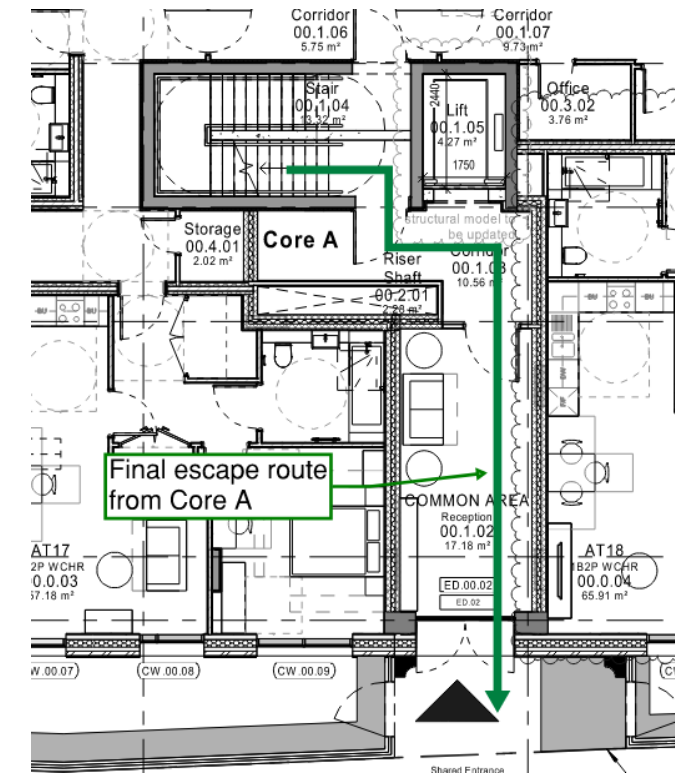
Final Escape Route from Core A at Ground Floor Level
